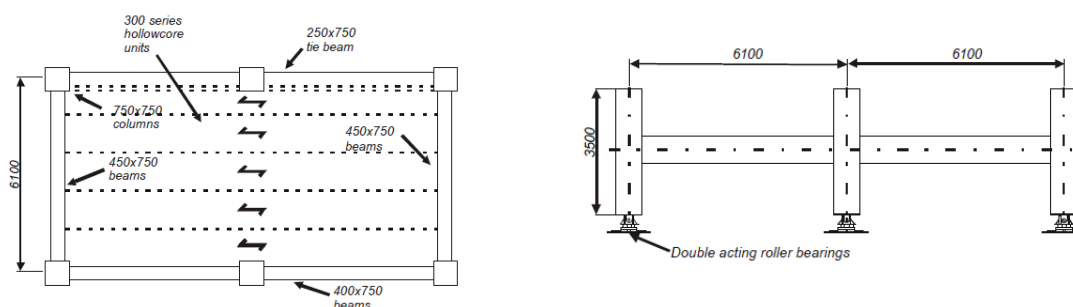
Frame floor sub-assembly test arrangement (Matthews 2005)
